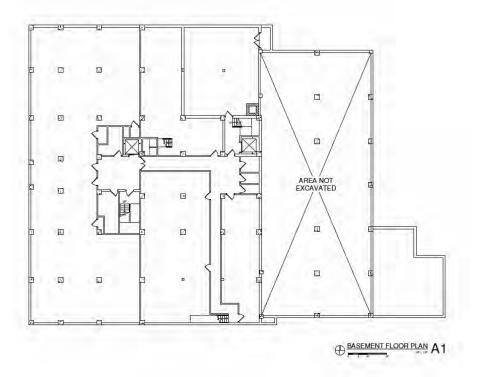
Current Floor Plans - Basement (Treanor Architects HL)
